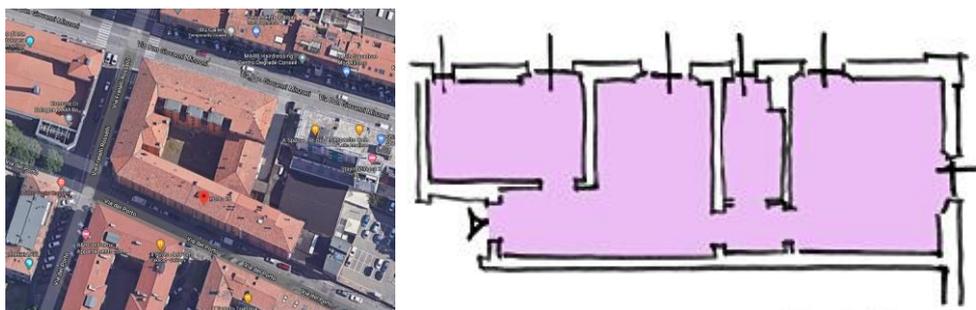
Porto 15 - (a) Building, and (b) Plan of an apartment
